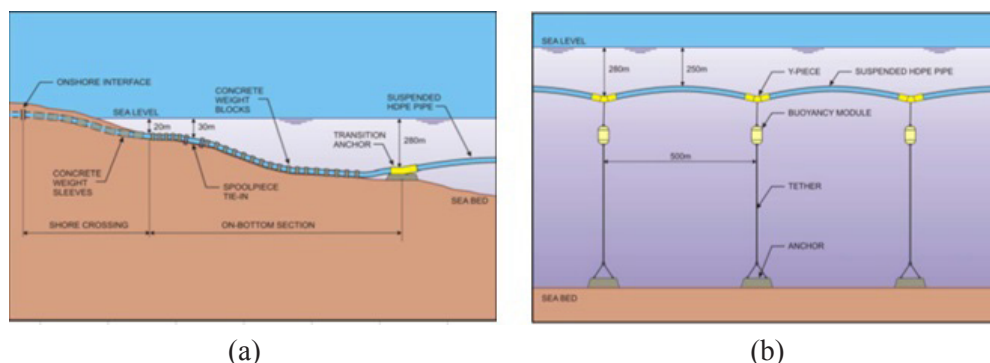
Schematic of On-Bottom Sections (a) Suspended Section General Arrangement (b)
